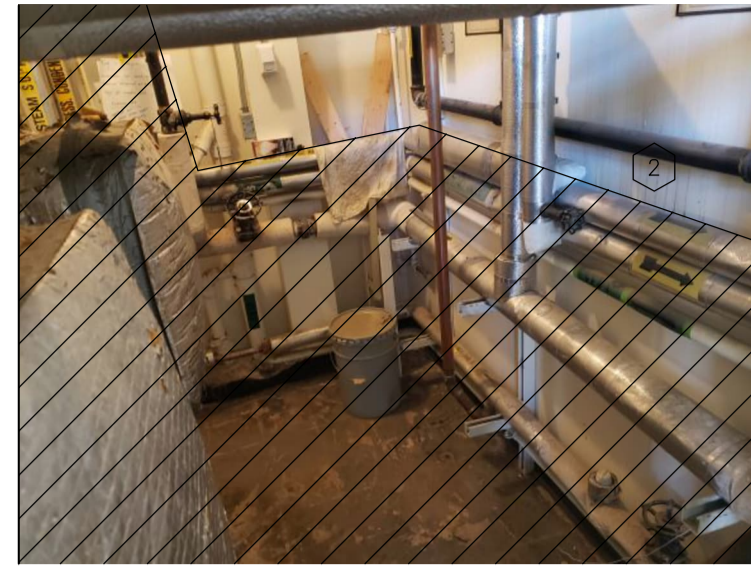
EXISTING AUTOCLAVES AND PIPING REMOVAL (2)
